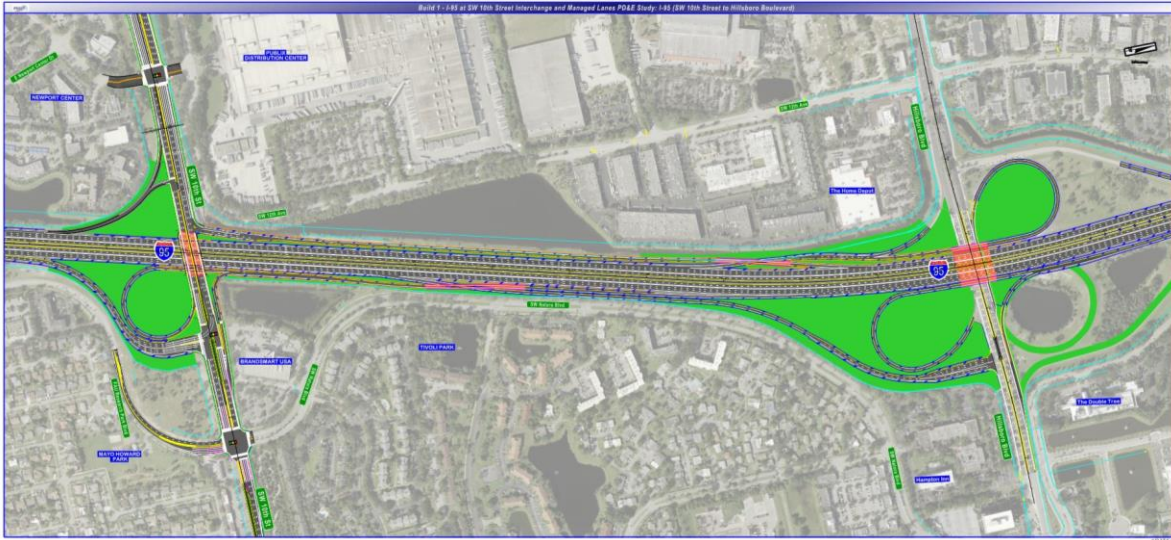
1: I-95 Alternative 1 (SW 10th Street to Hillsboro Boulevard)
